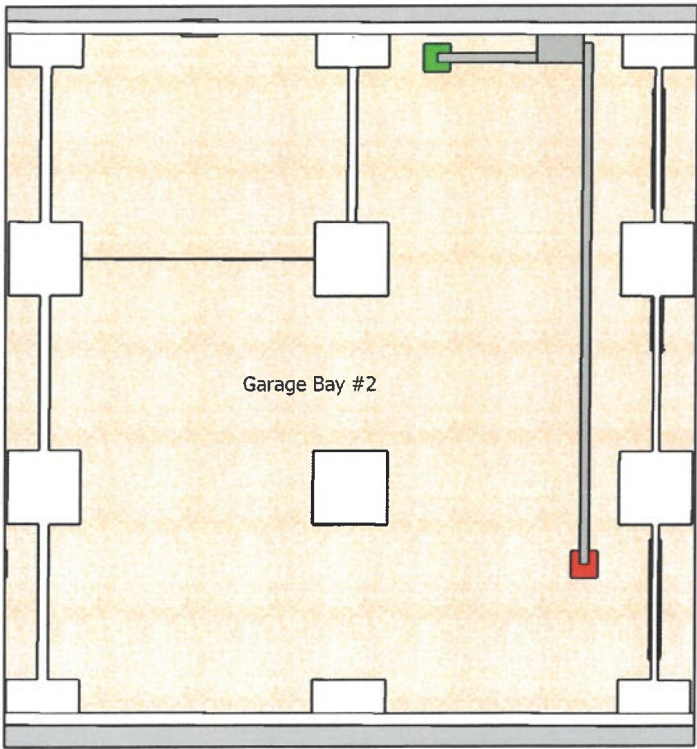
Isolated view of Garage Bay #2 showing recommended layout for HRV ducts.
